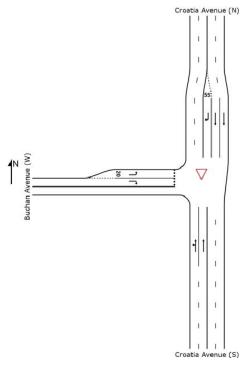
2026 Croatia Avenue/ Buchan Avenue Layout
